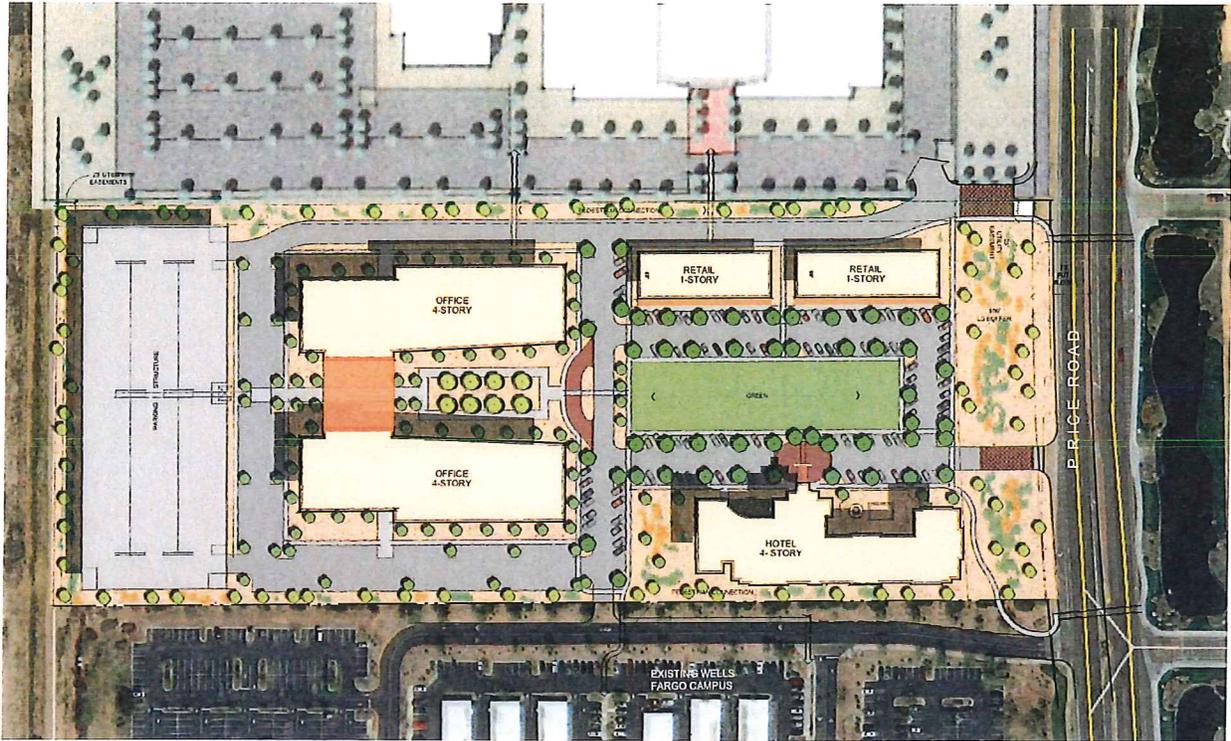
| CONCEPTUAL SITE PLAN C & D
